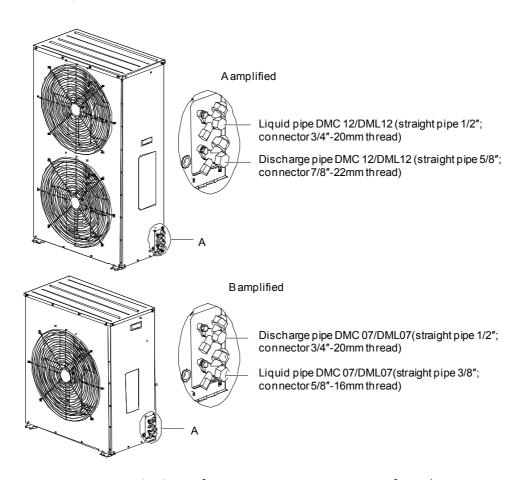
Refrigerant pipe connectors of outdoor unit
